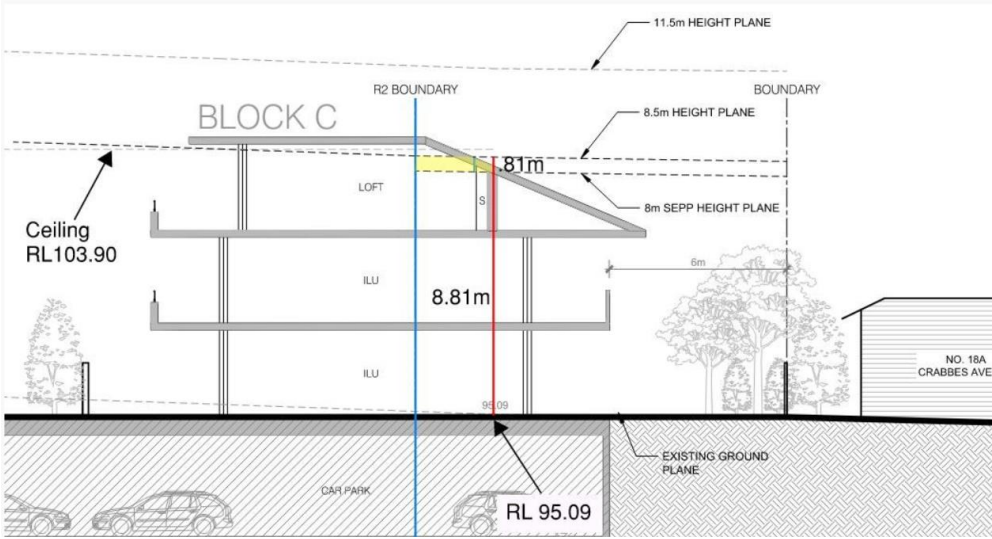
Extract of north elevation showing transition in heights (Source: Dickson Rothschild)
